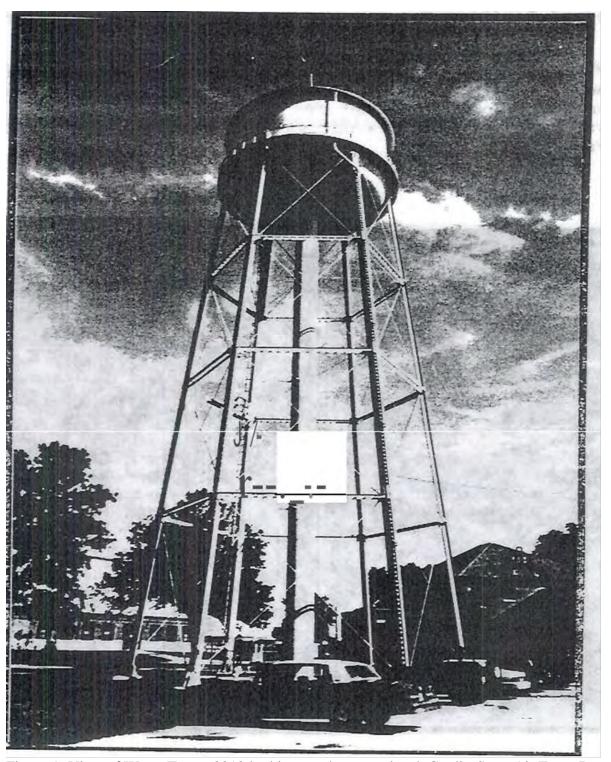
View of Water Tower 8010 looking southeast, undated. Credit: Scott Air Force Base archives.
